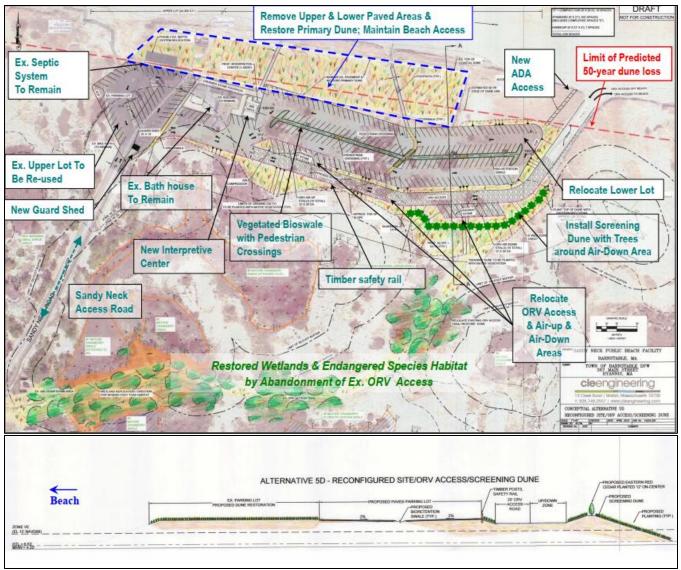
Plan view (top) and cross-section (bottom) of conceptual Alternative #5D from the 2016 study.
